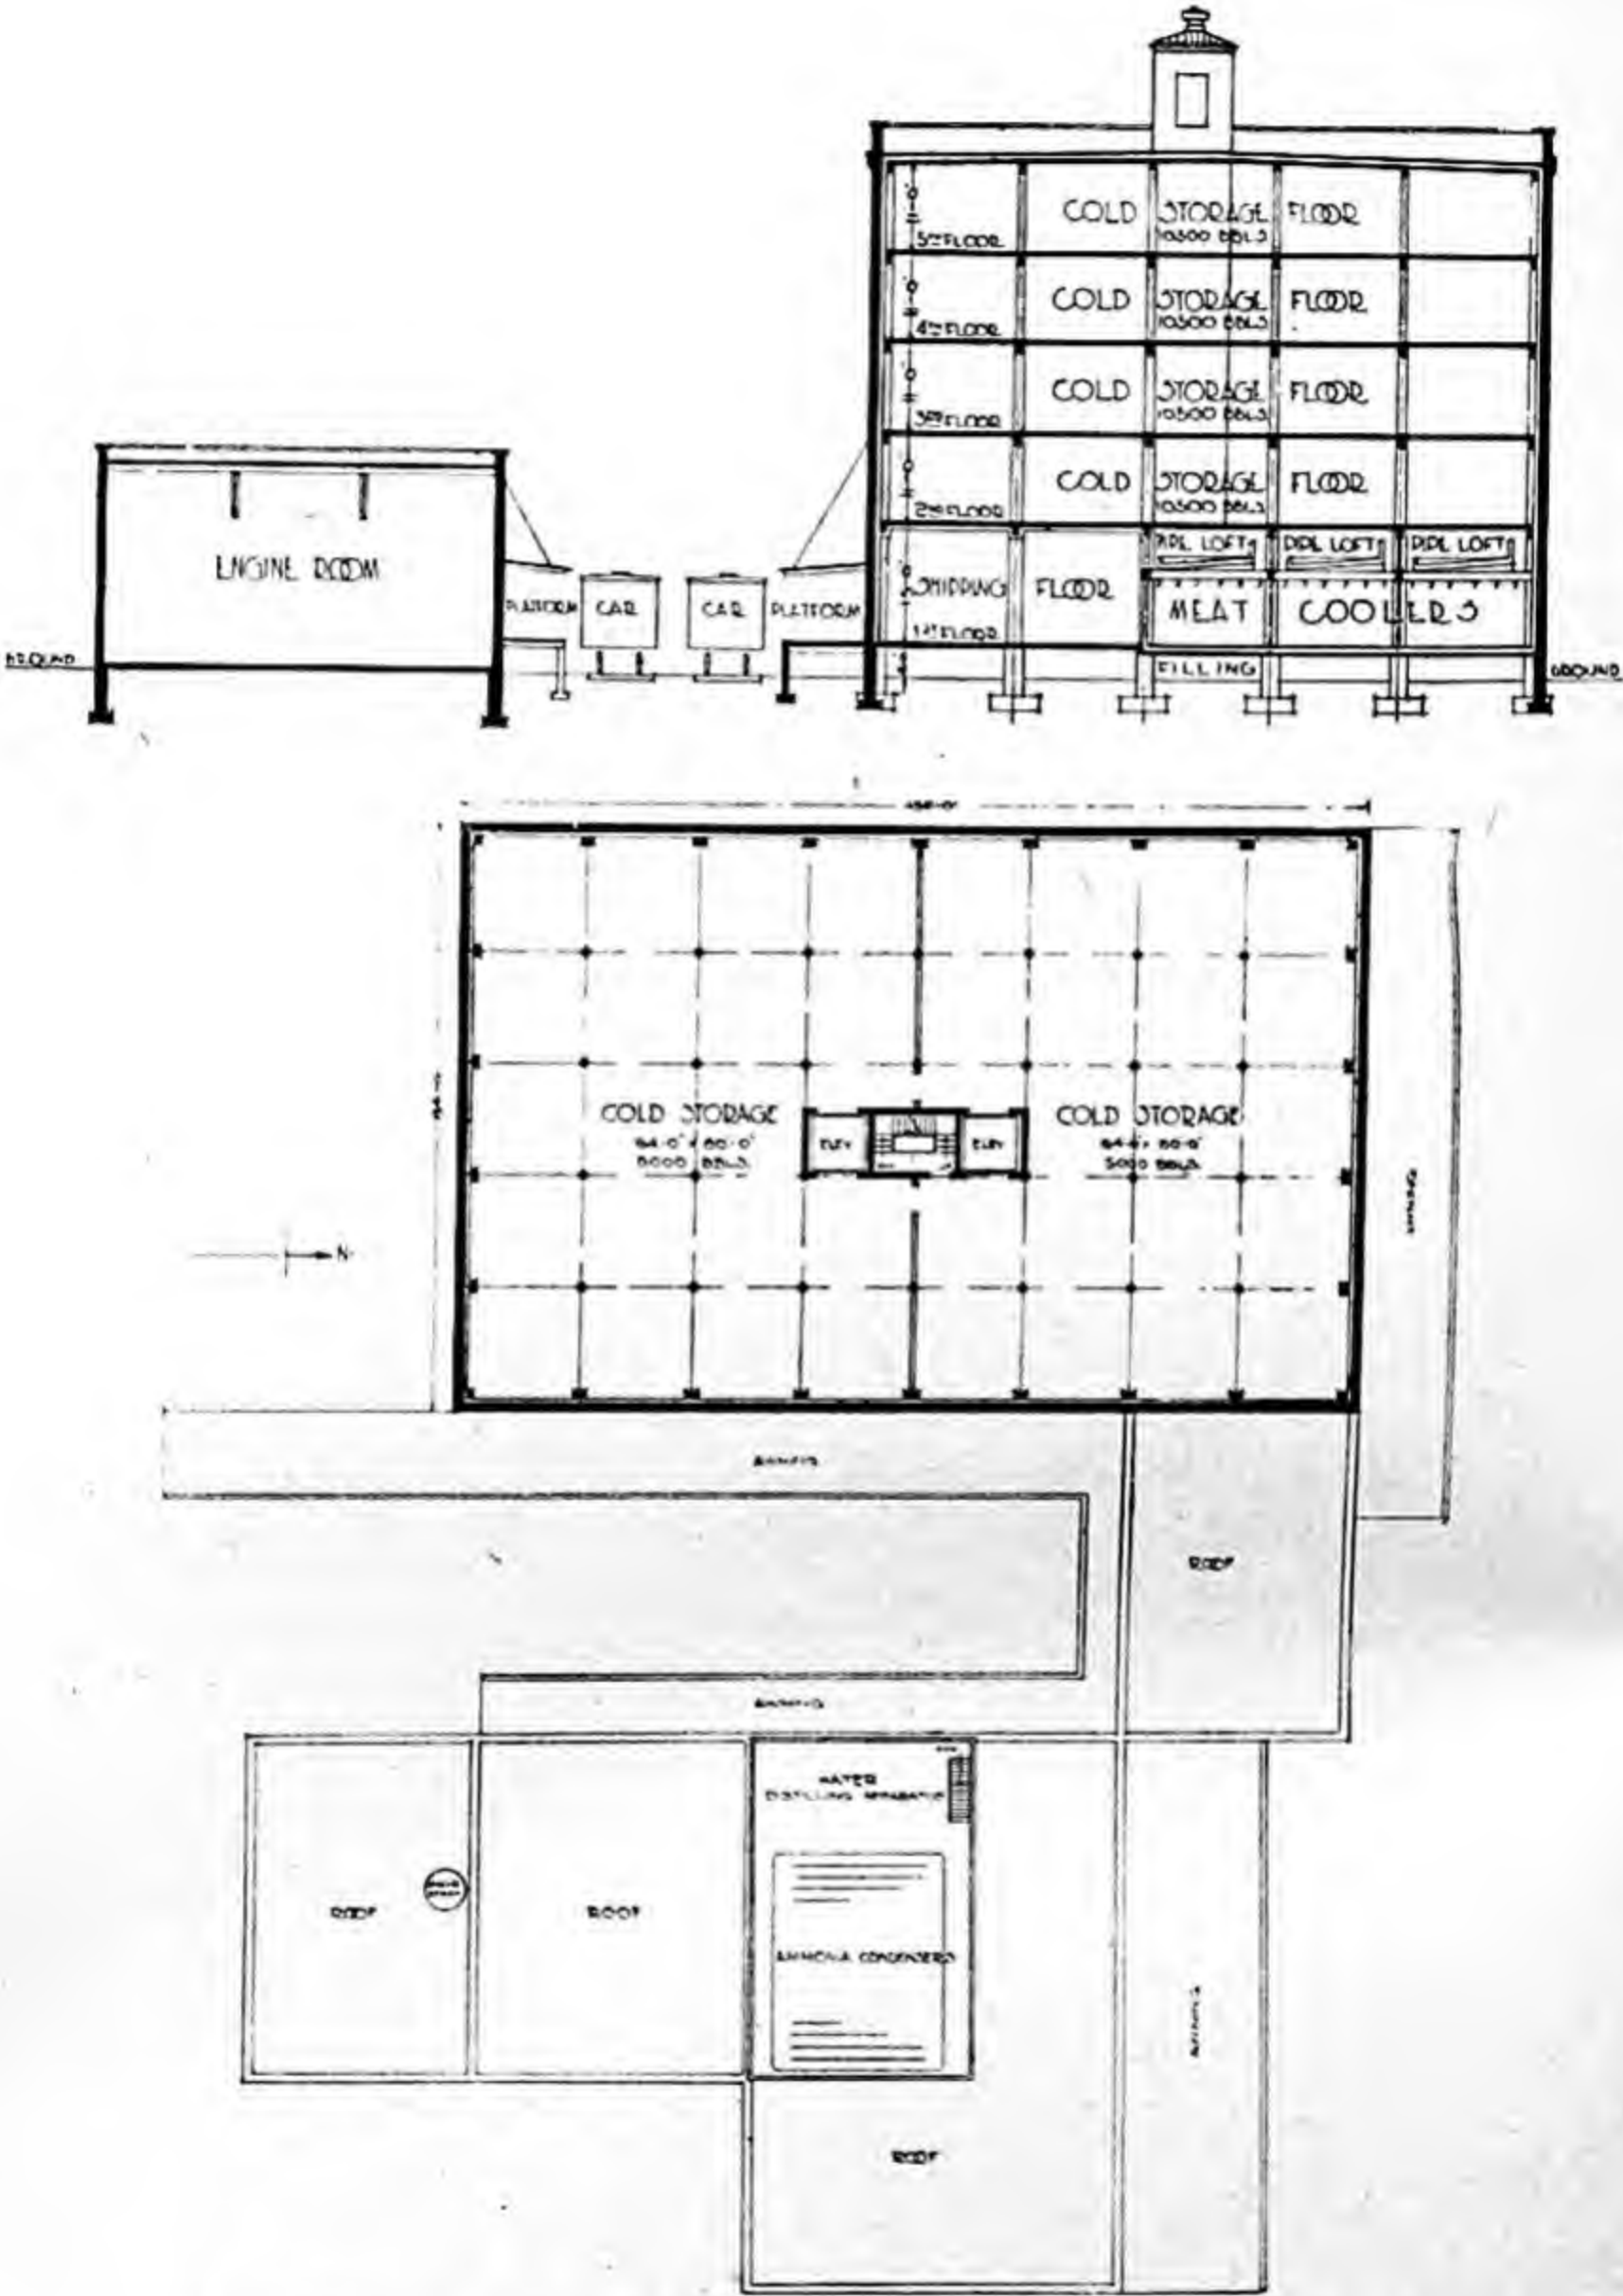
Plan and Elevation of Small Cold Storage and Ice Making Plant.
